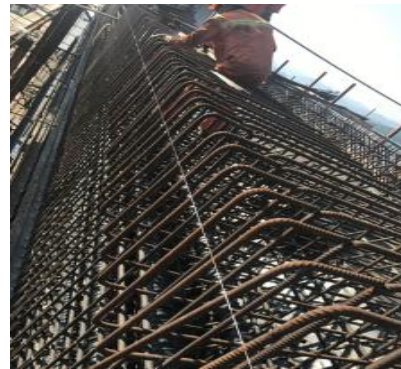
the pull line method controlling the reinforcing bar plane
